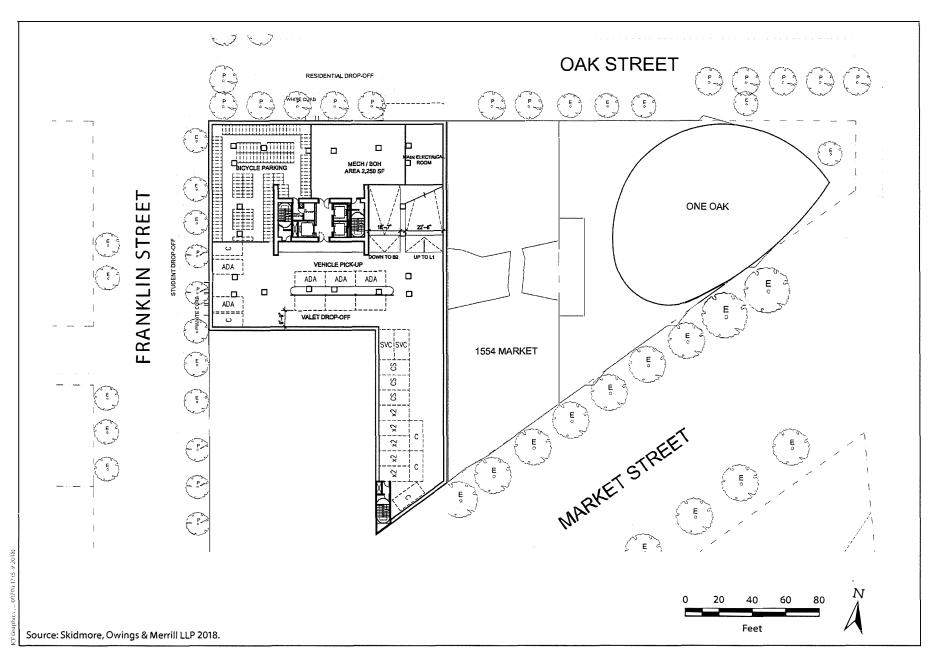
98 Franklin Street Project – Proposed Basement Level 1 Plan
